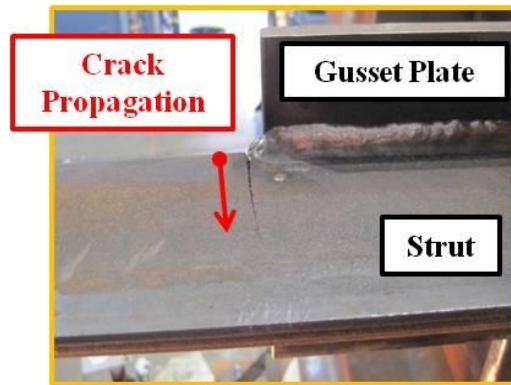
K Frame with Fatigue Crack in Strut (KF_2)
